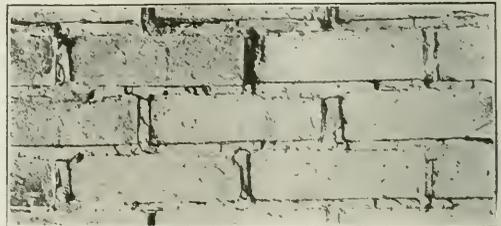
BOILER WALL, BRICKS SET IN FIRECLAY
